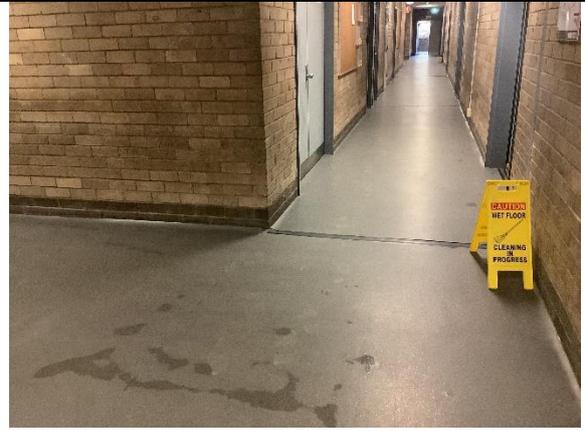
Building A – A.G.1 – Throughout – Floor – Floor Covering – Vinyl Sheet- Light Grey
